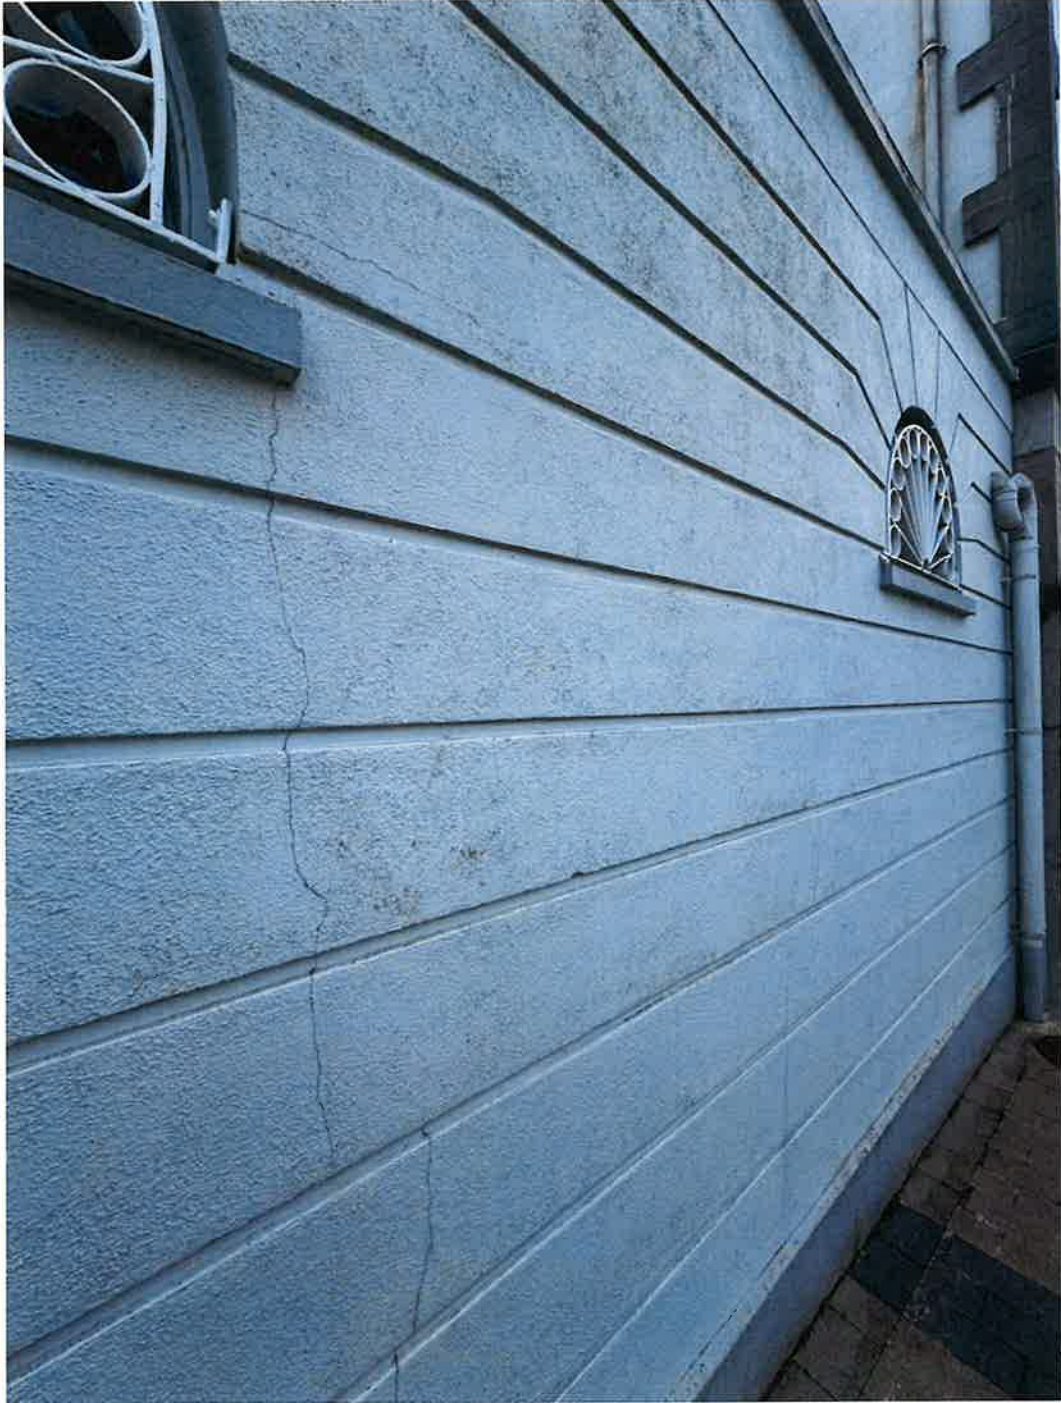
Section of modern walling onto which the defibrillator unit will be installed. The wall is of concrete construction and the horizontal-channels are formed in cement-render. Note the window guards are painted mild steel (rather than 'wrought-iron' as incorrectly described by the NIAH).
